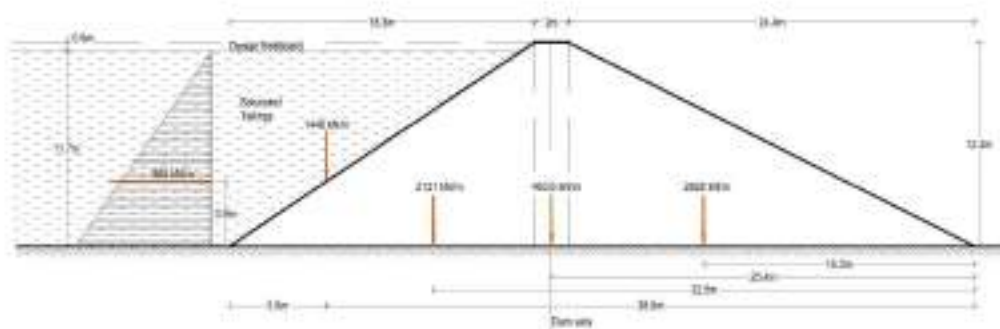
Equilibrium of forces on the critical section of the third raised northern embankment of the Tailing Storage Facility (TSF)
